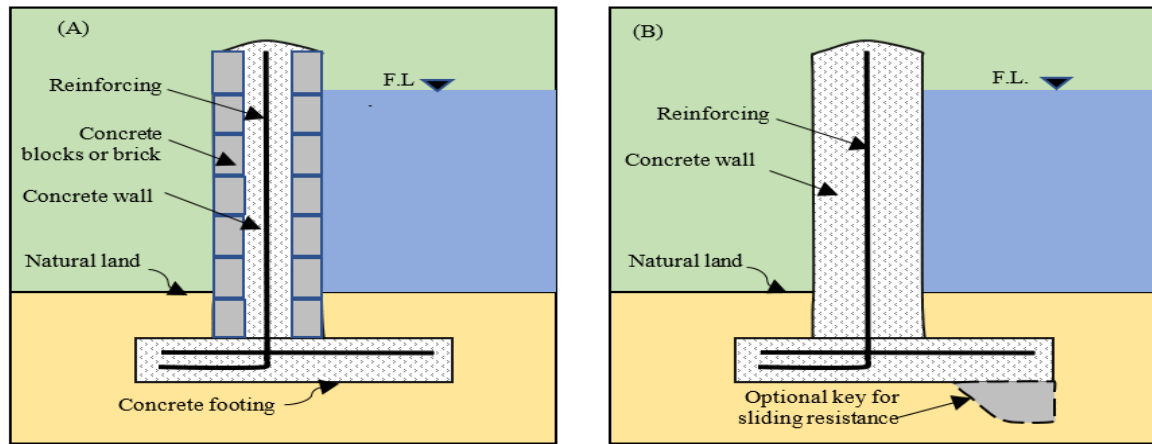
Concrete cantilever floodwall reinforcement: (A) Concrete blocks or bricks wall, and (B) Concrete wall [27]
